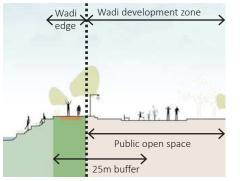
Public park interface with plaza and stepped accessible wadi bank
